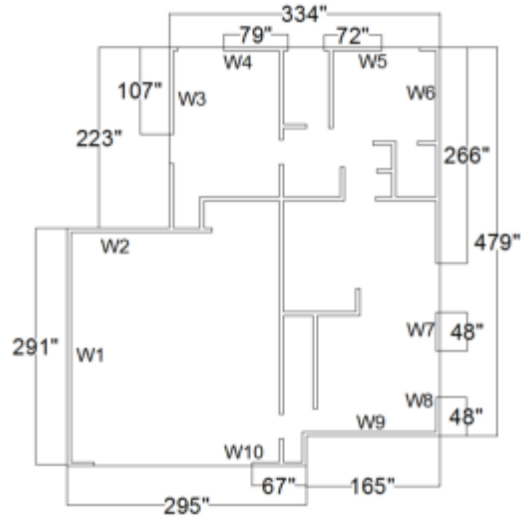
Floor Plan 5 – One-Story House with a Garage
